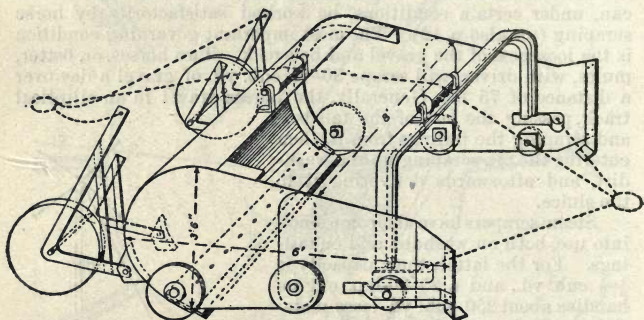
BOTTOMLESS STEAM SCRAPER.
